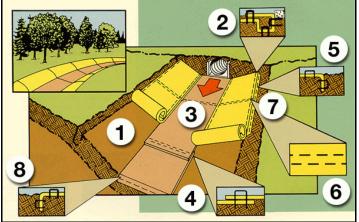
Example erosion control mat installation in a channel or drainage swale (North American Green, 2002).
